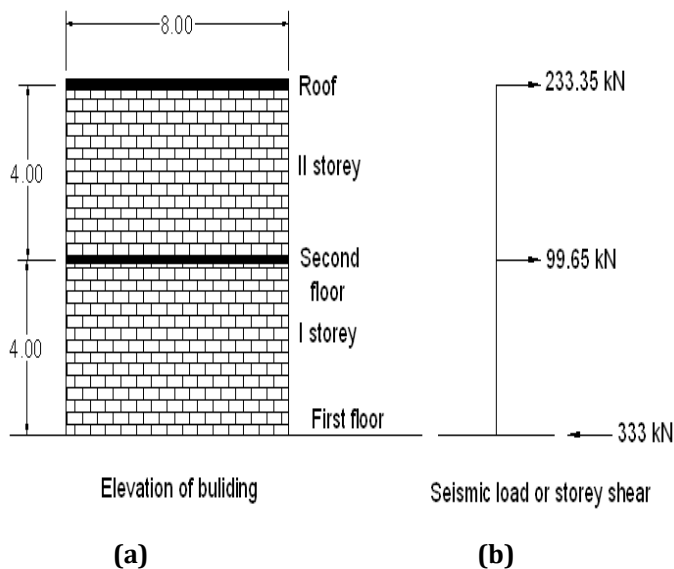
(a) Elevation of Building (b) Seismic load or Storey shear
